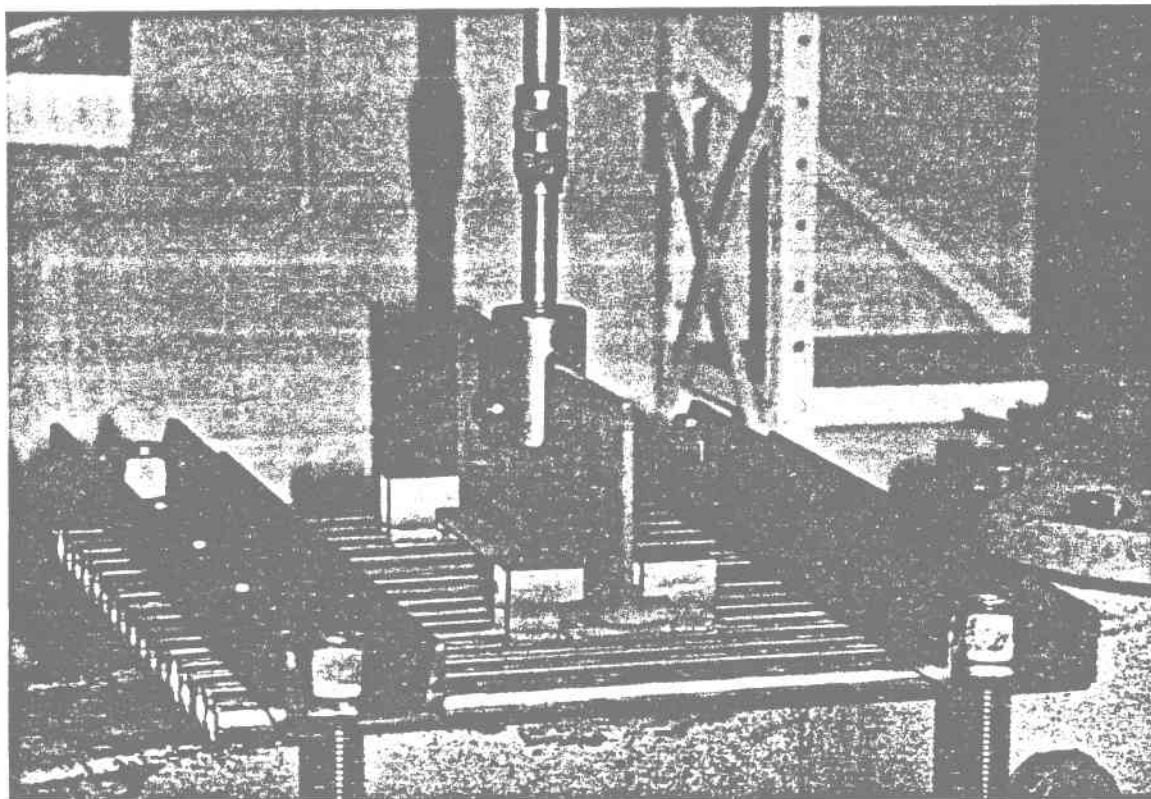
Close-Up of Test Rig Used to Tensile Load Prototypical Panel Support Lugs
